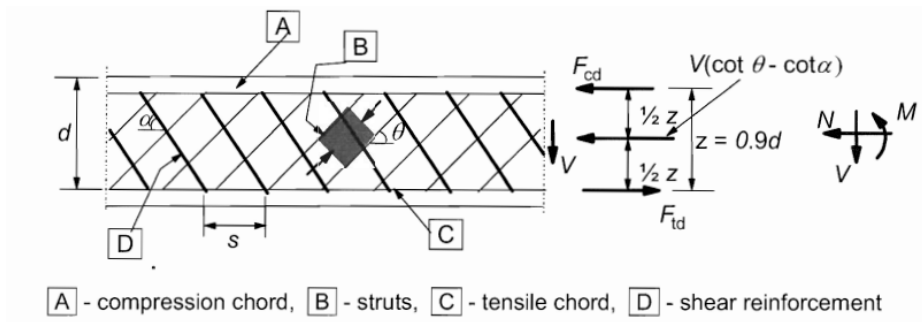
Truss model and parameters for shear reinforced beam [7]
